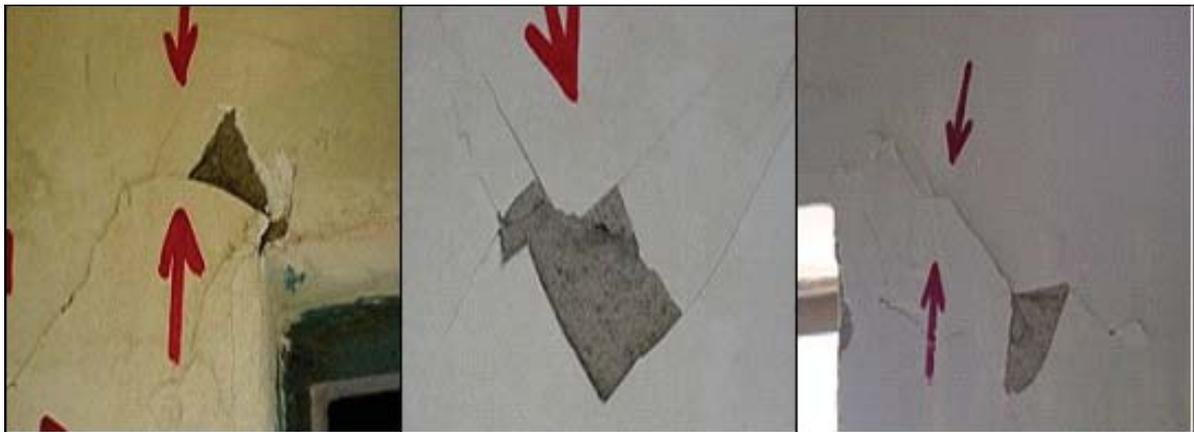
View of the minor damage at the first floor of the RCC structure at Sonepur Bazari Project.
